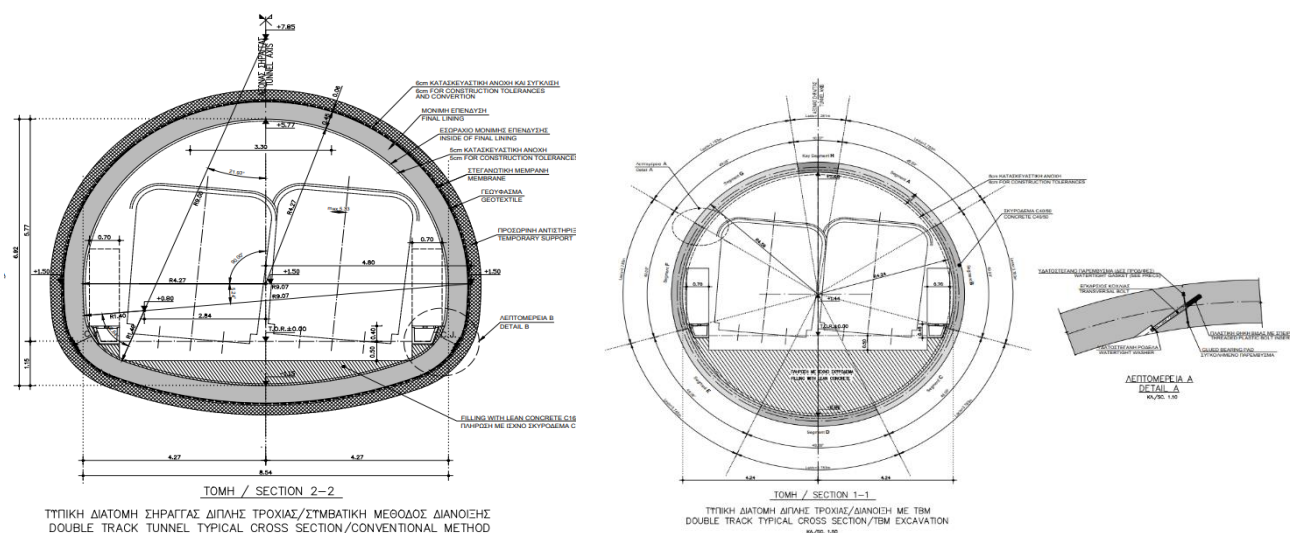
Standard cross-section of a double-track tunnel/ excavated with NATM (left) and with TBM (right) (Attiko Metro S.A.)
